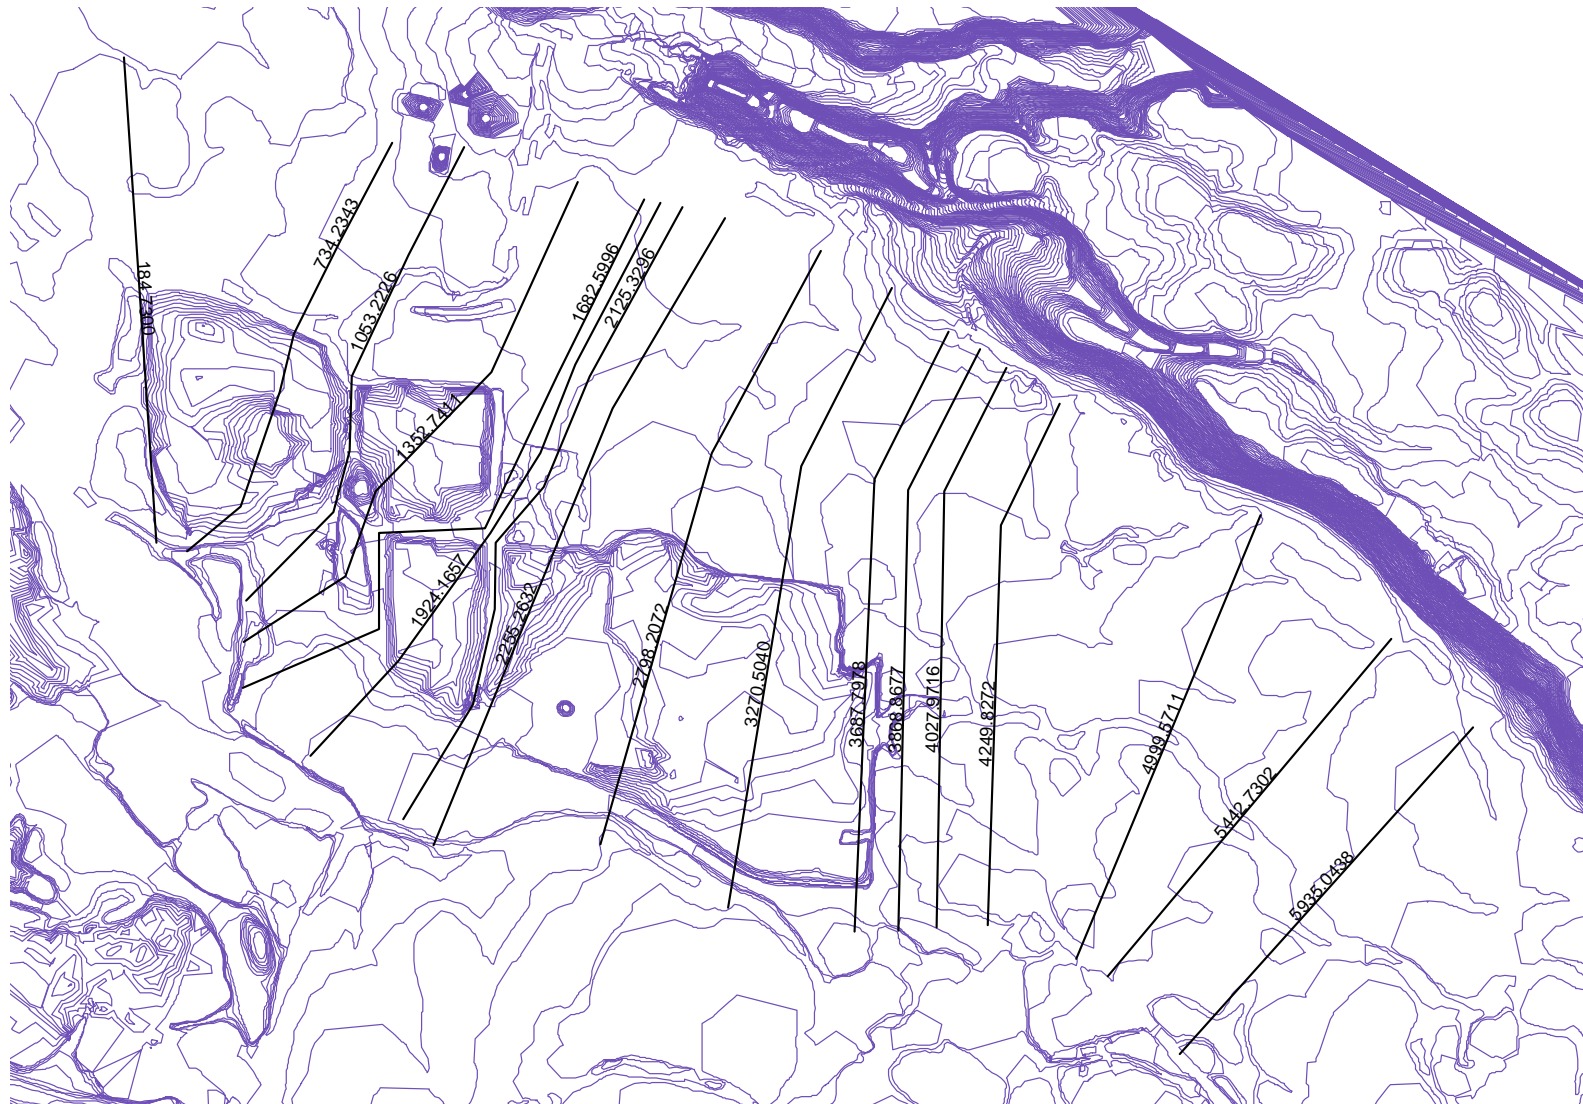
Plan view of the Daybreak Ponds showing locations of cross sections used in the hydraulic analysis.
